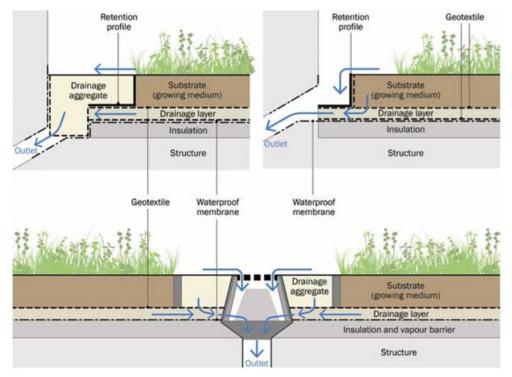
| Example Details of outlets from a green roof (CIRIA C697)
